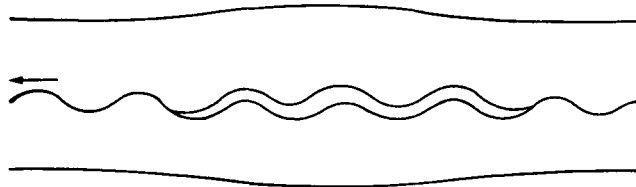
Sinusoidal pattern of cleavage fracture of pipeline.
